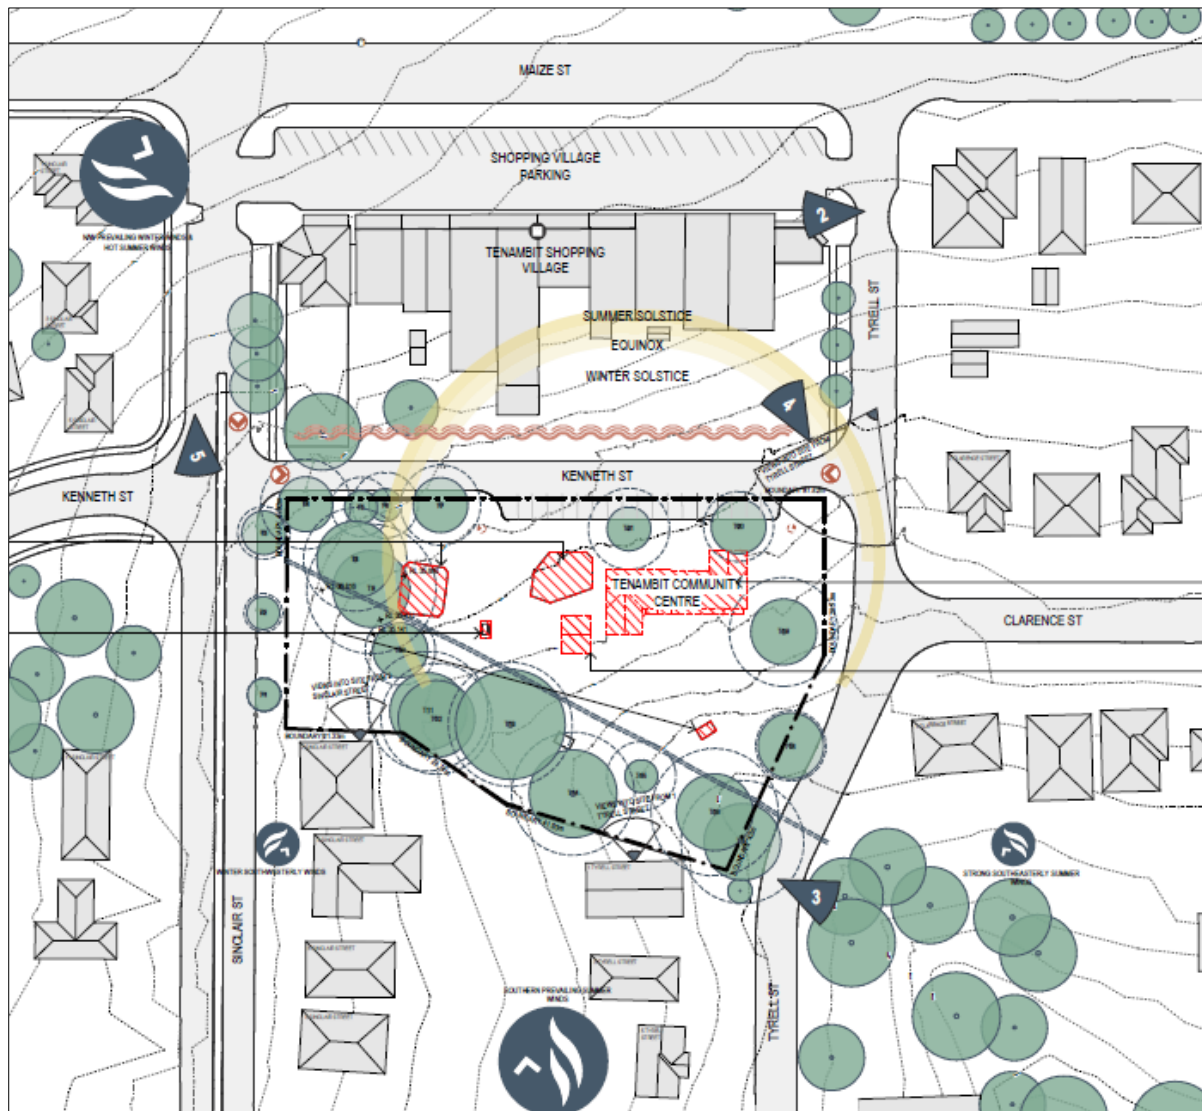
Demolition Plan. Source: AJC Architects (April 2024)
